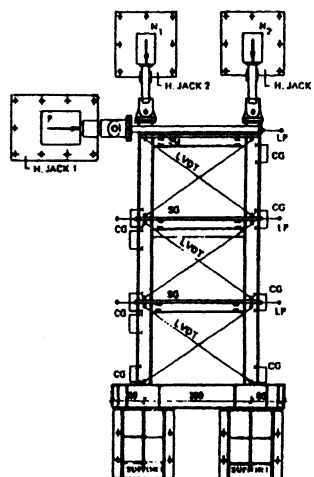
Position of models during testing, arrangement of equipment and instrumentation
